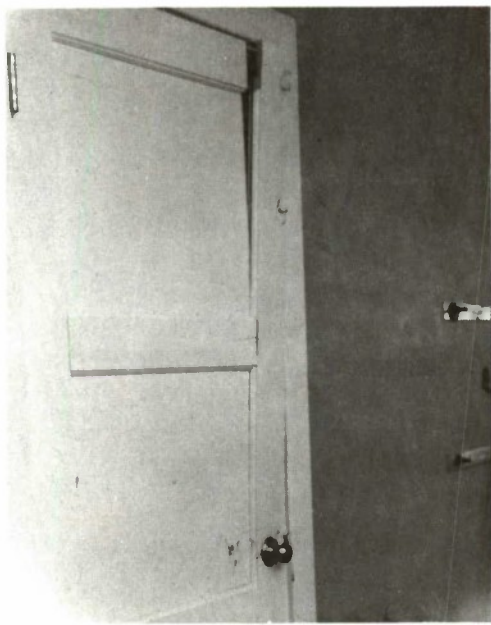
Door Between Dining Room and Kitchen After Test No. 2.
